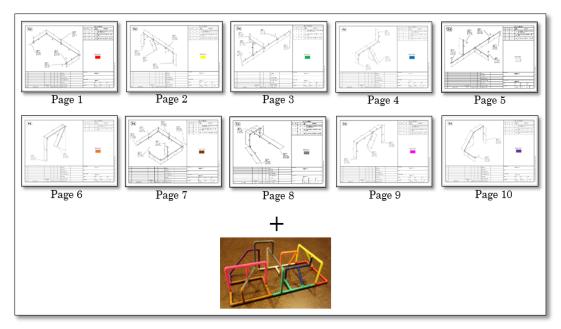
2D Isometric Drawings plus a 3D Physical Model of the Assembly.
